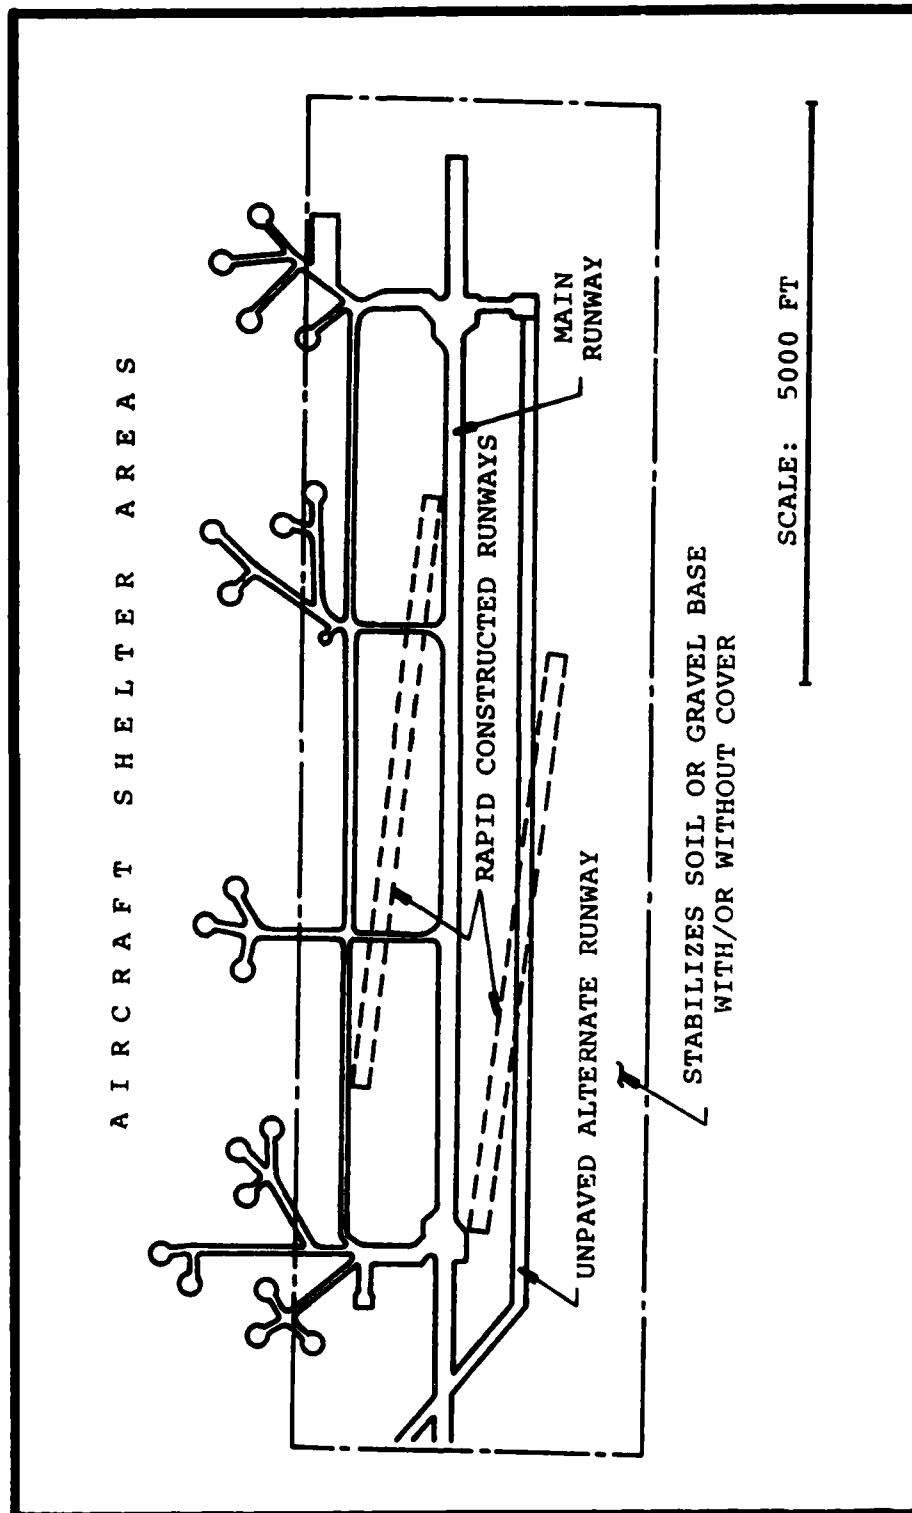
Typical Airfield Layout With Unpaved Alternate Runways
